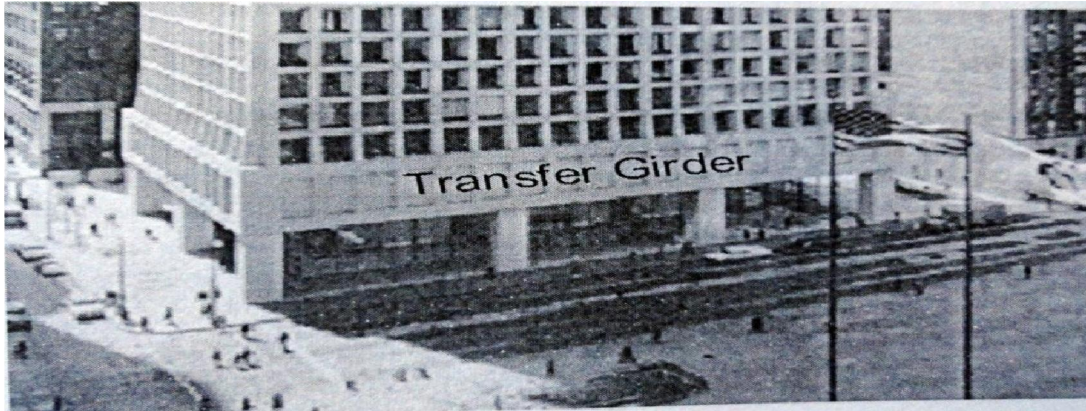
Deep beam, Brunswick Building, Chicago: picture courtesy of (Columbia.edu)
